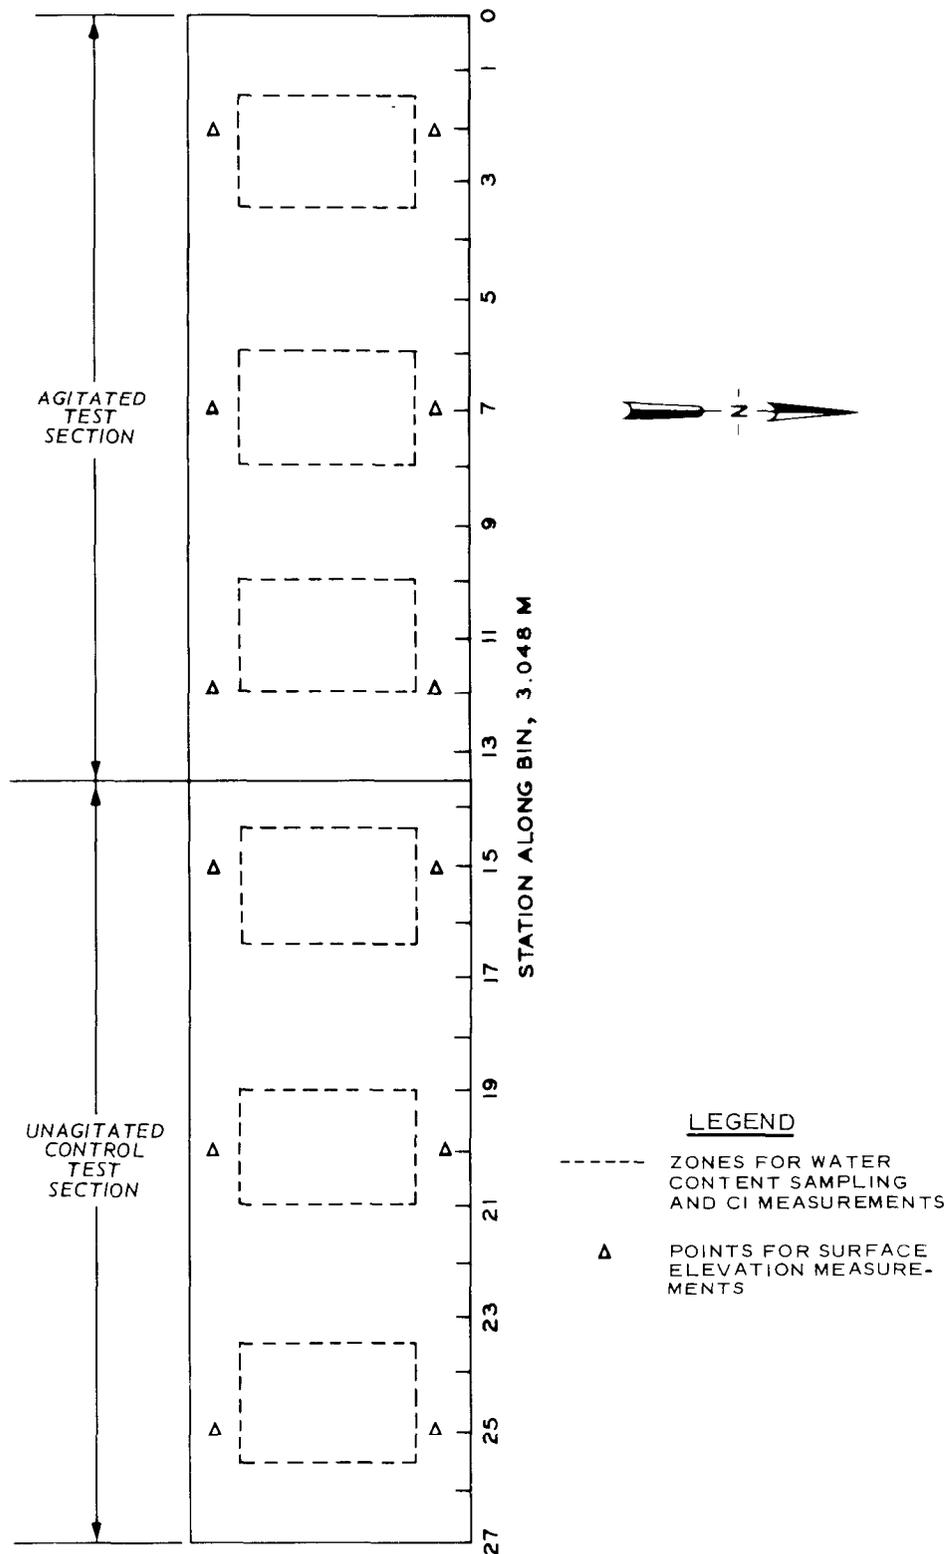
Plan view of test bin illustrating locations from which surface elevation measurements and water content samples were taken
